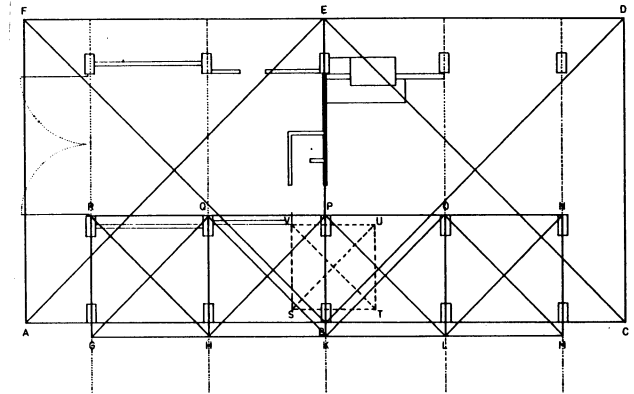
Schindler, Beach House, first-floor plan, proportional analysis (author).
